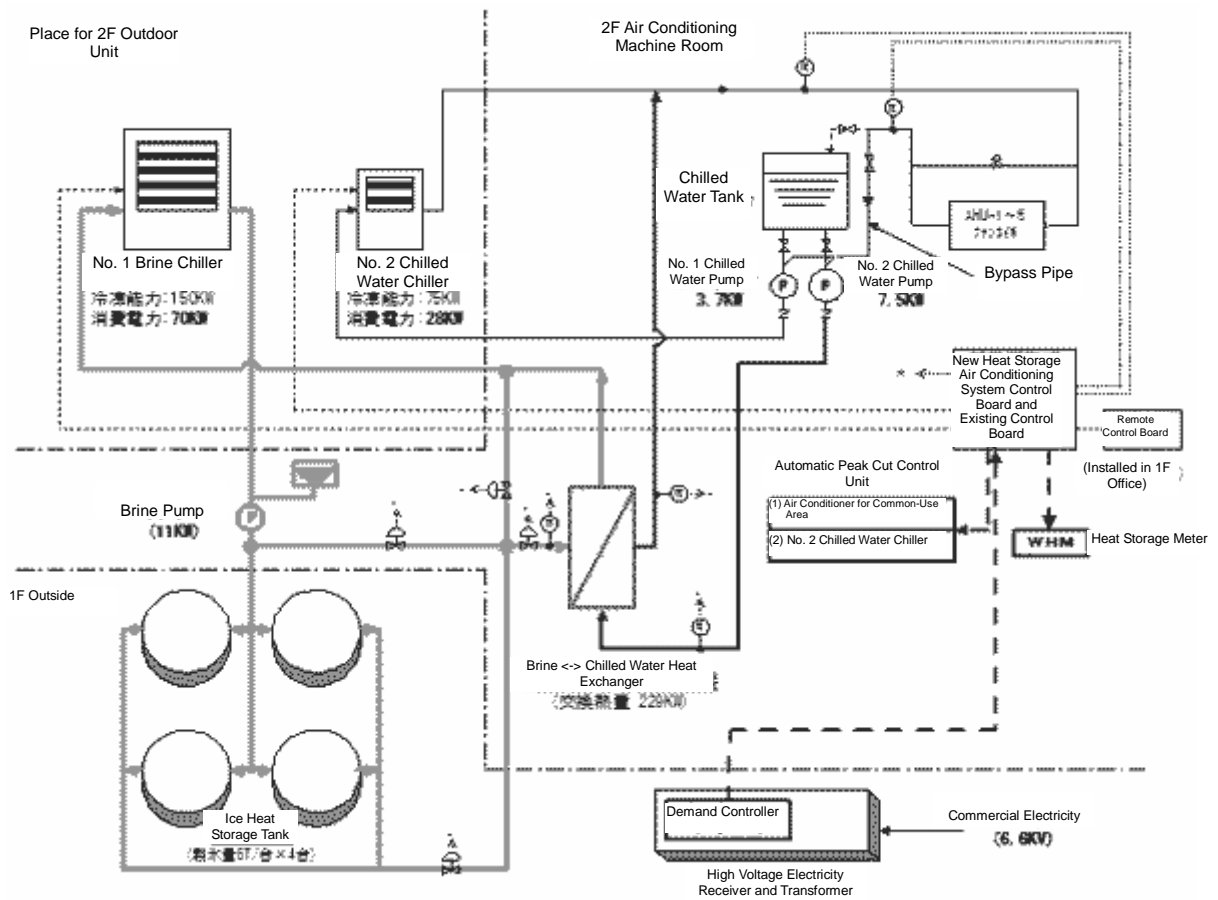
Manufacturing Room Air Conditioning System (After Reforming)
